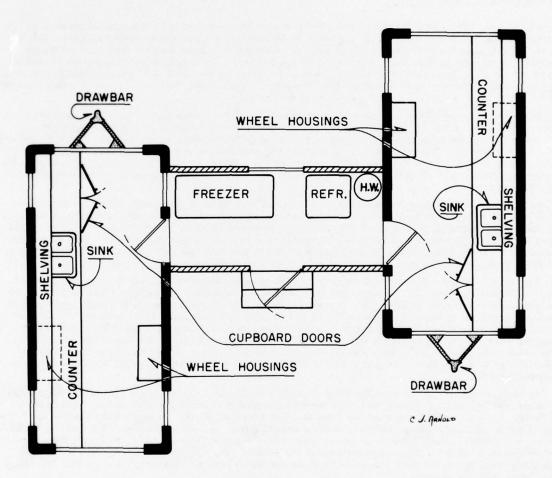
Floor plan of laboratory trailers. These were modified 18-foot house trailers connected by a 12- x 6-foot breezeway.
